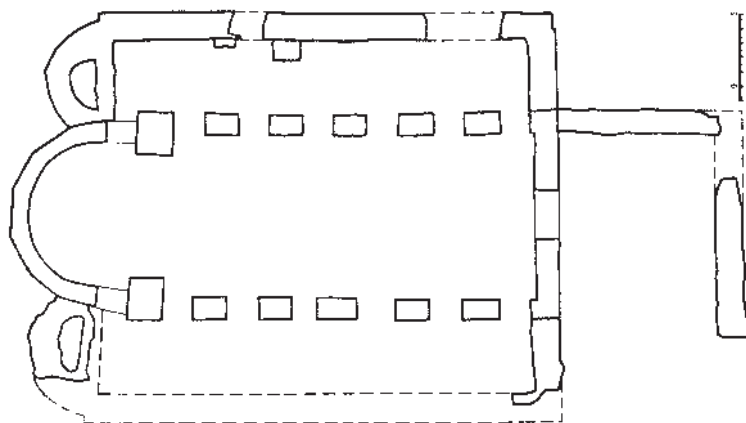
Alakhadzy: plan of first basilica (church no. 1).
